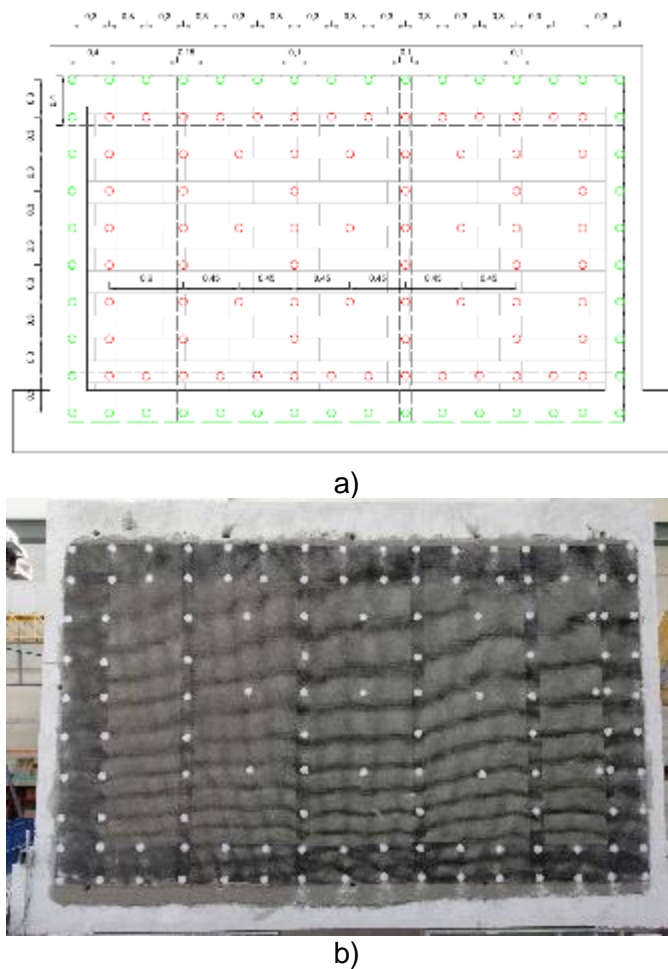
Specimen R1-OOP: a) strengthening schematic layout; and b) general view.
